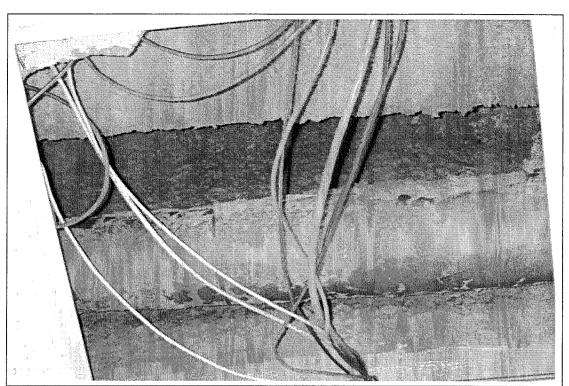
View of fireproofing applied to I-beam and perimeter wall with overspray on piping above missing lay-in style ceiling tiles, East wing, 2nd floor South entrance vestibule
